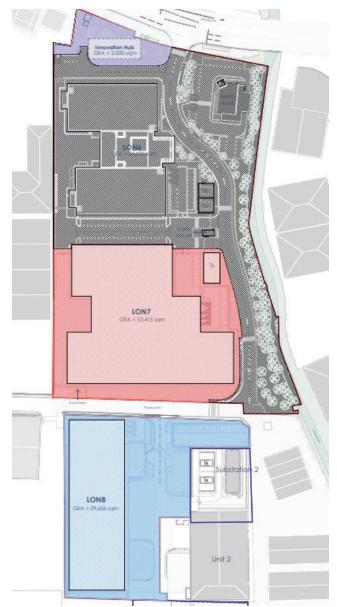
Proposed Parameter Site Plan (please note – a larger version of plan can be found in the Committee Plan Pack)
